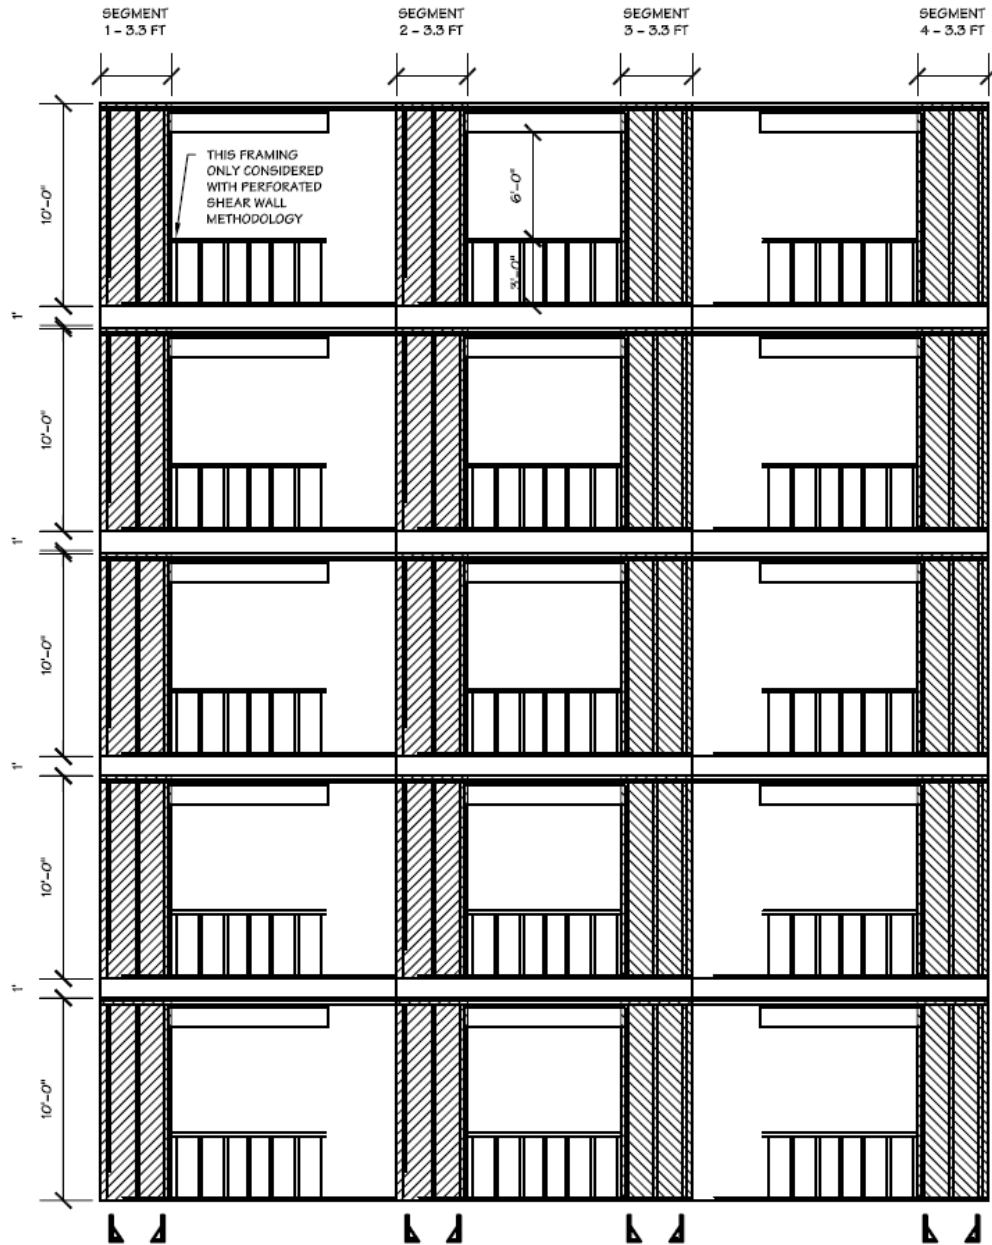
Design drawings of archetype buildings, model # 13, residential 6 x 3.3 ft – six separate walls (Filiatrault, 2007)
